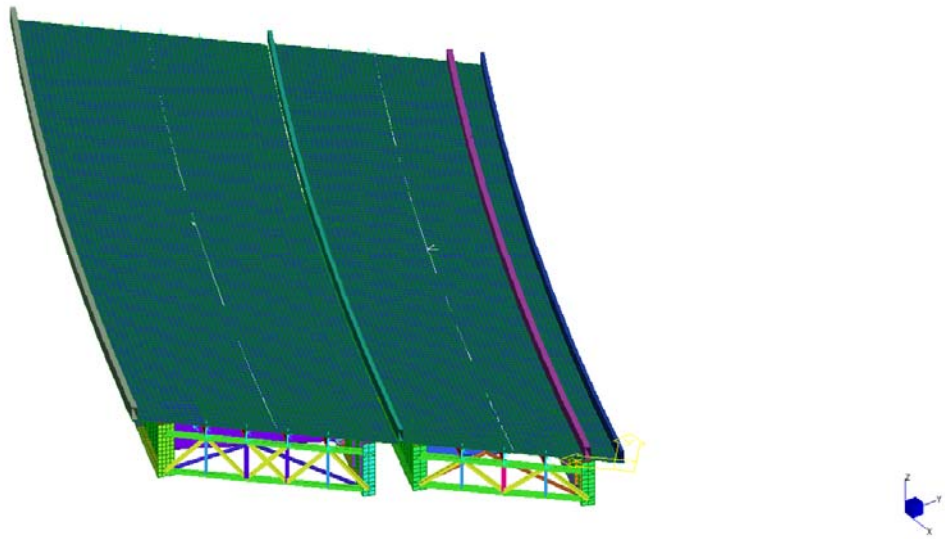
Structure 1237155 – Simply Supported Span - Finite Element Model
